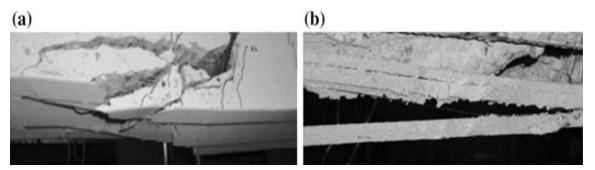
Failure by concrete cover separation: (a) Followed by flexural shear failure crack propagation, (b) Fracture along the NSM strip [94].
